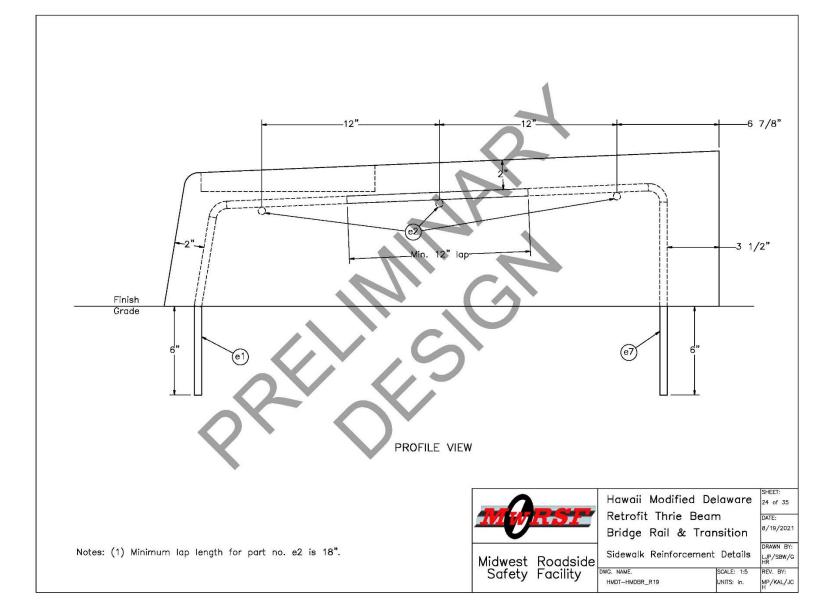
Sidewalk Reinforcement Details, Test No. HMDT-1
